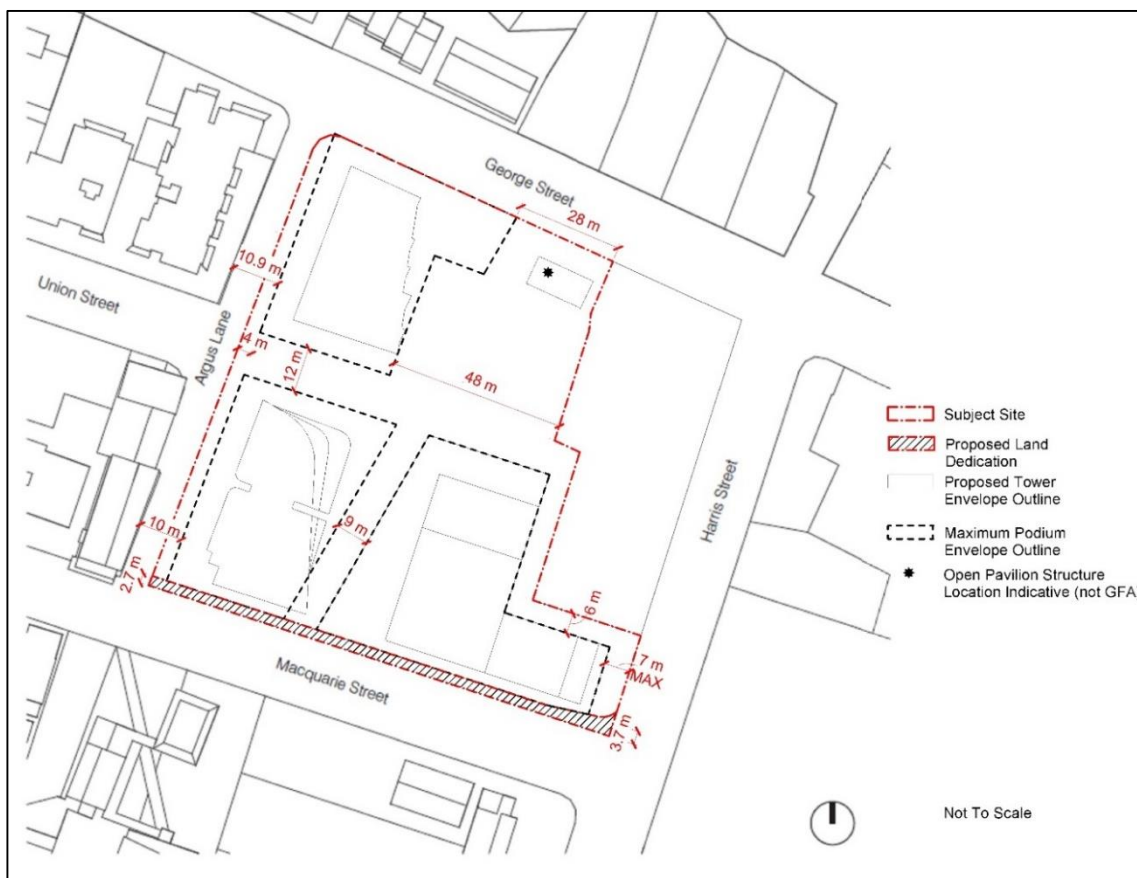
Control diagram: Setbacks and separations at street level
